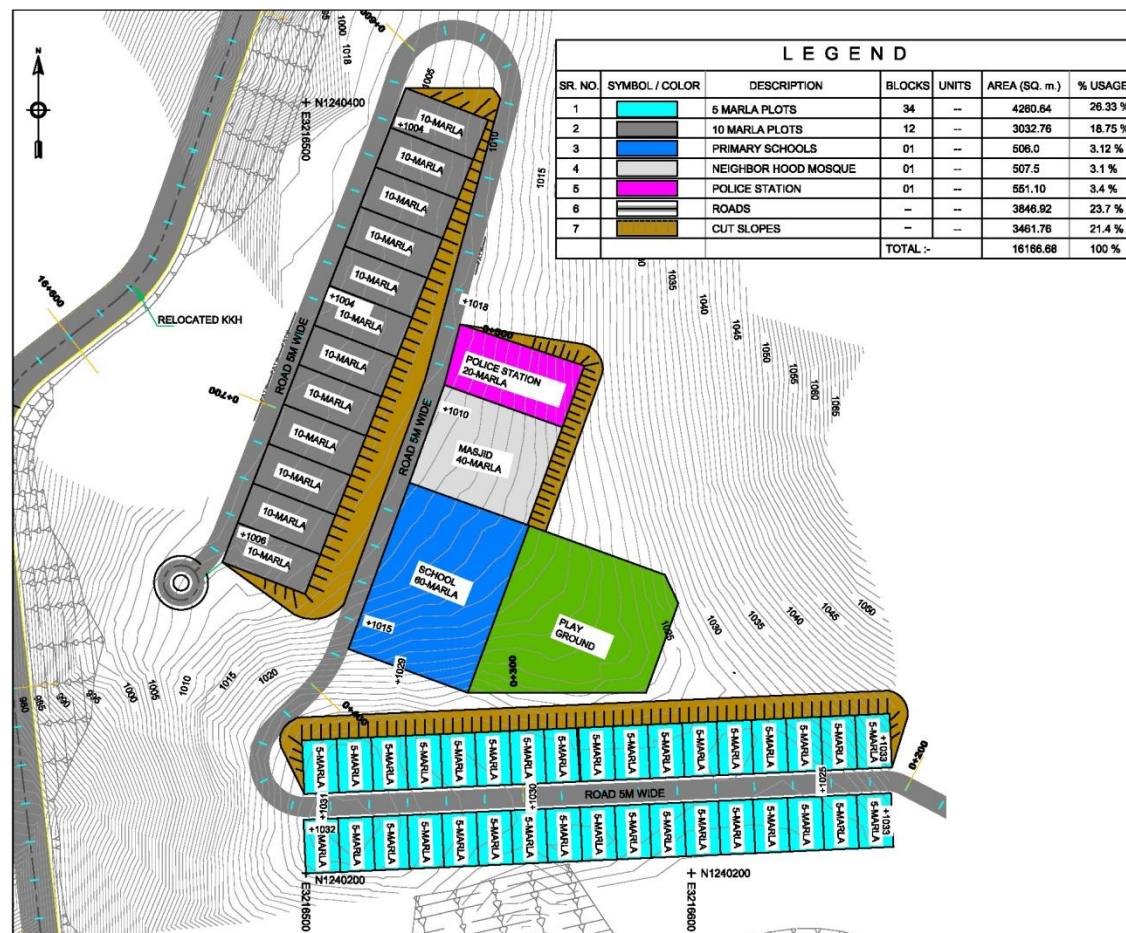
A Sample Lay out Plan for a Resettlement Site
